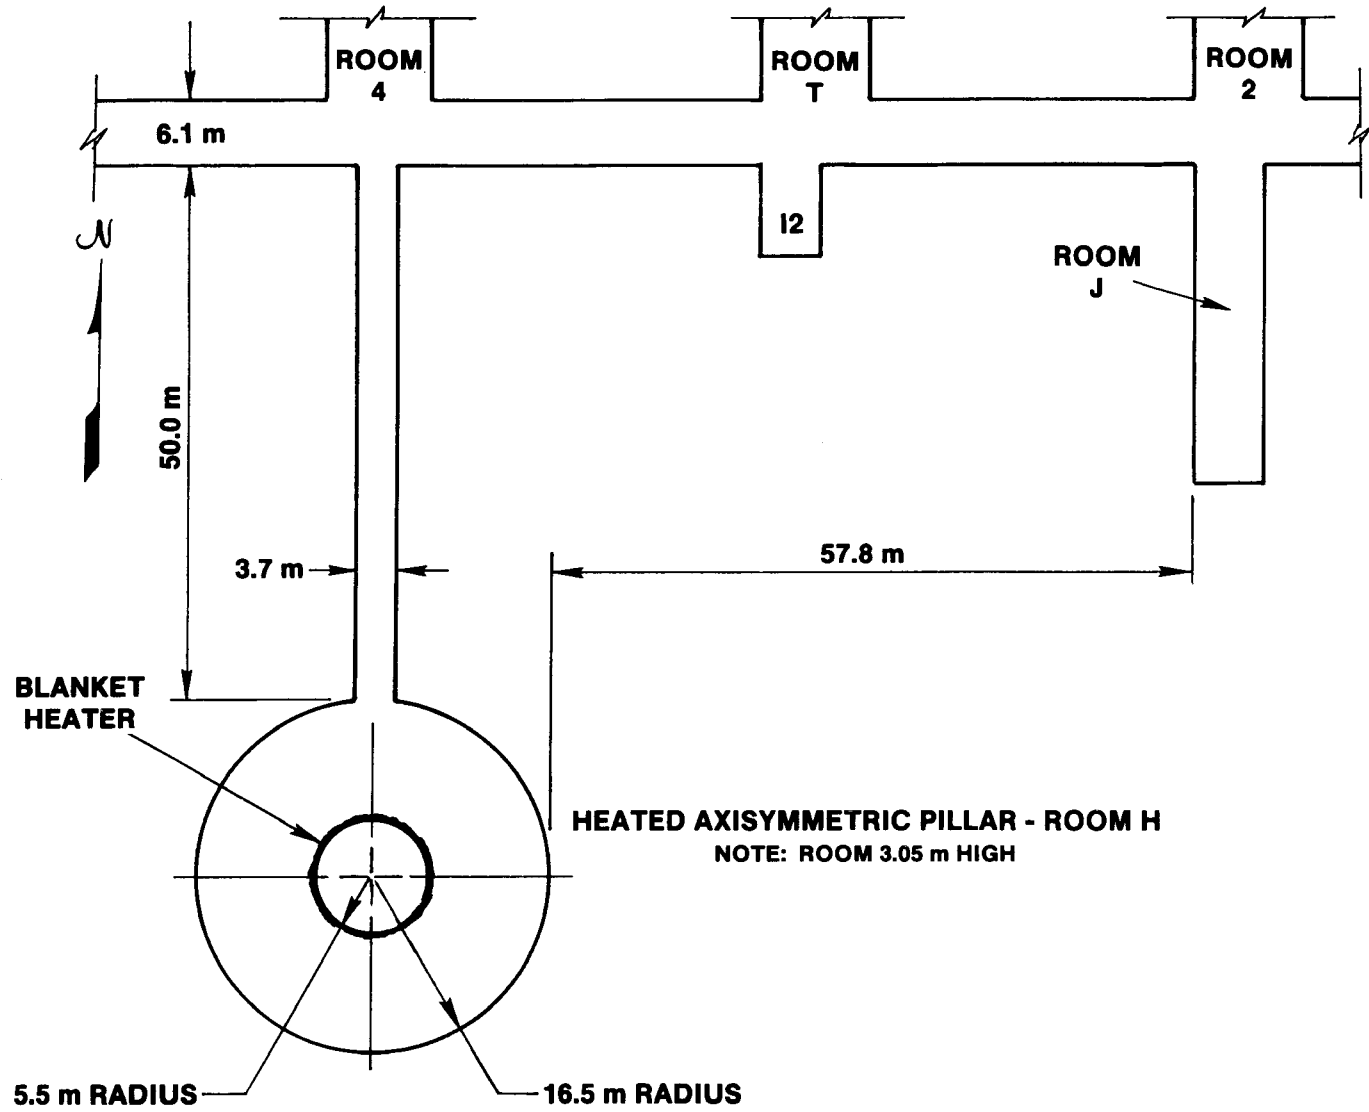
Plan View of the Axisymmetric Heated Pillar Test Room
